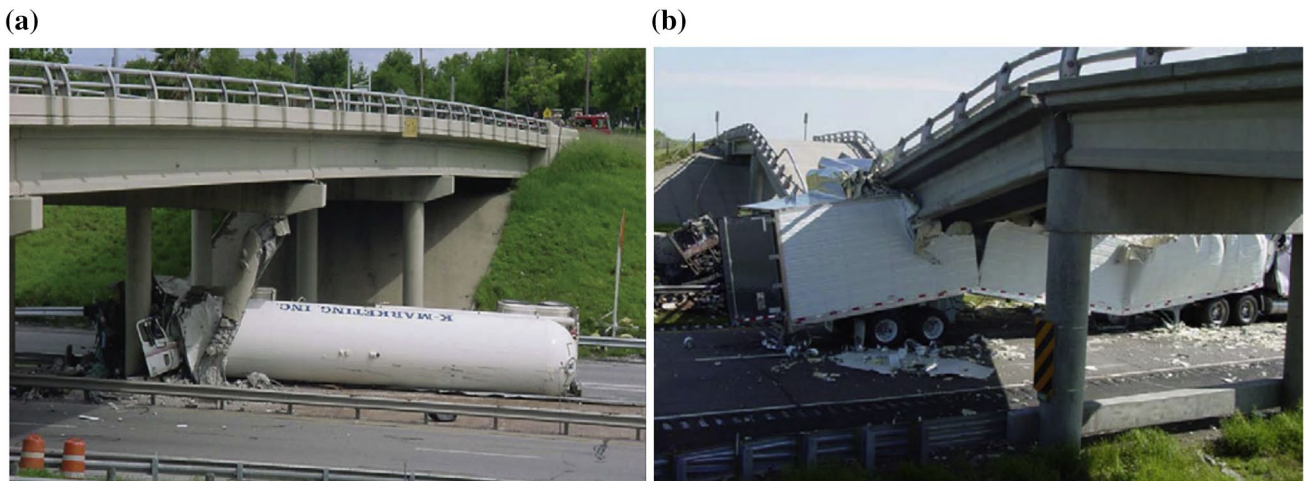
a Failure of bridge column due to truck collision [73], b collapse of bridge superstructure after colliding a tractor-trailer [27]
